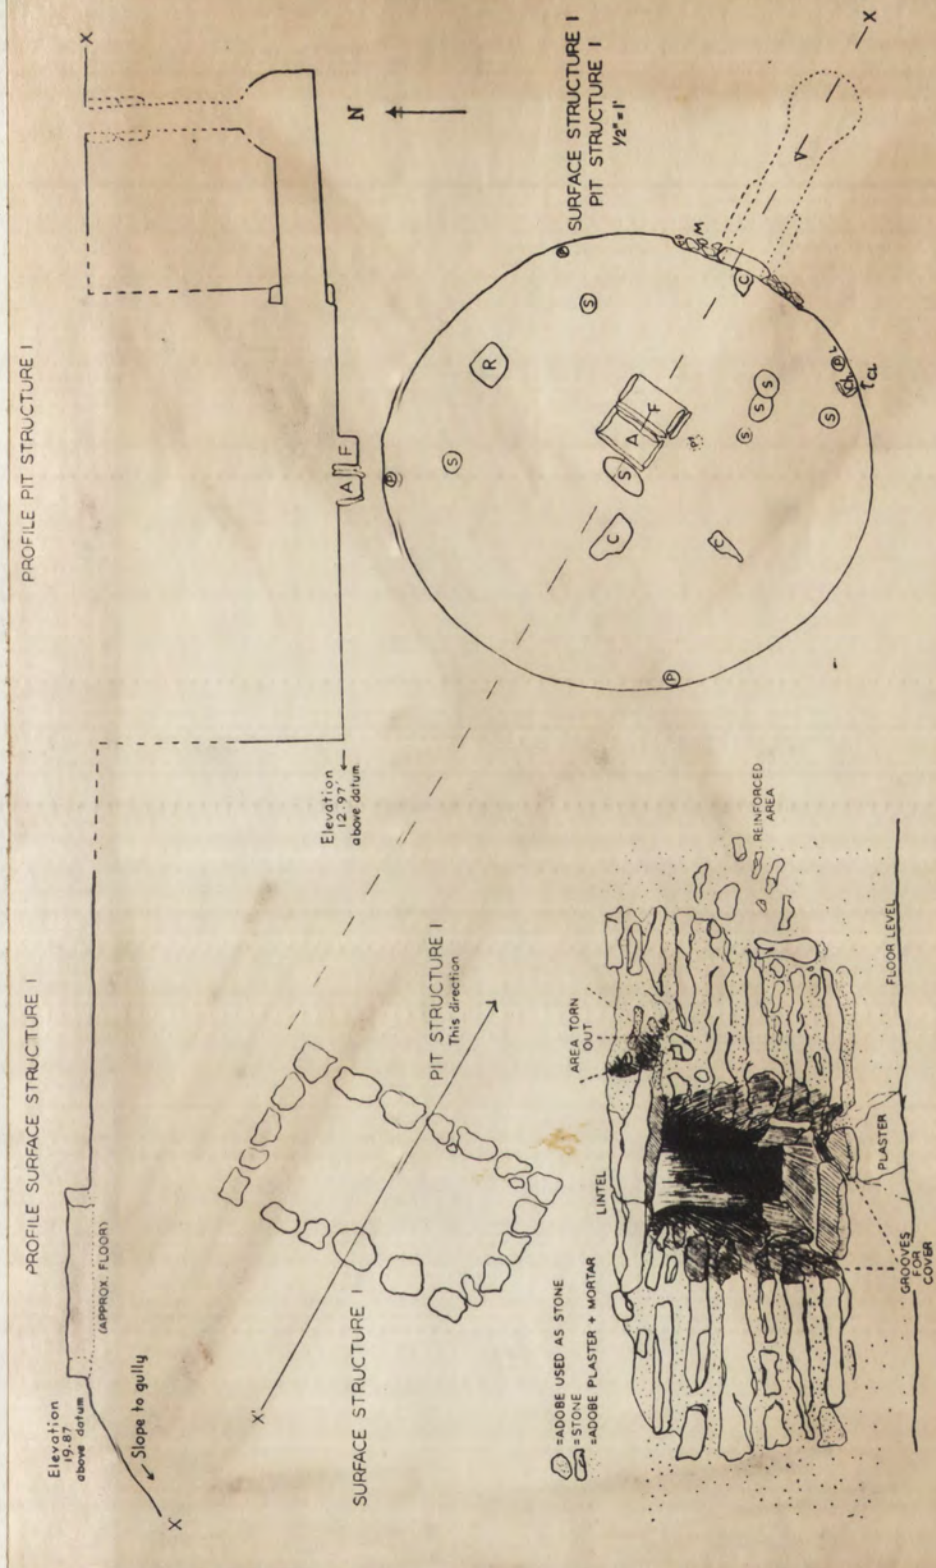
Site RB 1006. Plan and profile of pit structure 1 and surface structure 1, and detail of masonry around ventilator opening, southeast wall, pit house 1-1006. A, ash pit; C, cover for ventilator; Ch., charcoal; F, fireplace; L, jarolite; M, masonry around opening to ventilator tunnel; P, postholes; R, flat rock with charcoal below; S, sand lenses beneath floor; V, ventilator tunnel; X'-X, line of profile (dotted lines indicate reconstruction).
